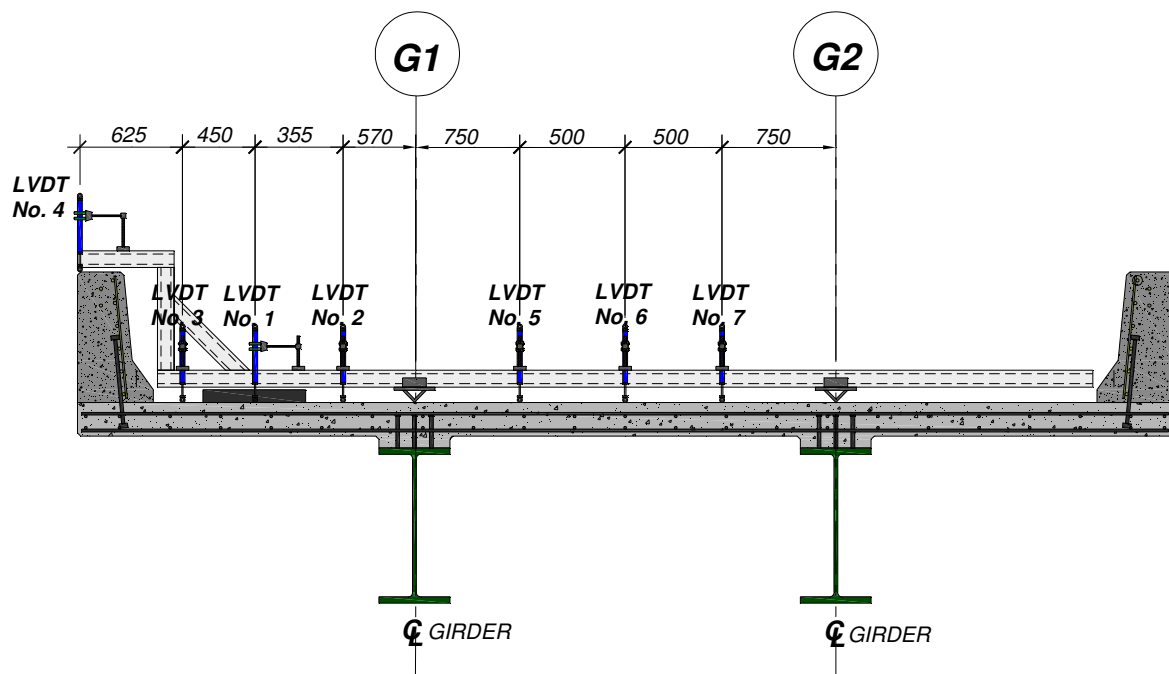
Schematic illustrating the LVDT supporting apparatus used to measure deflections of the cantilever and internal panel relative to the girders
